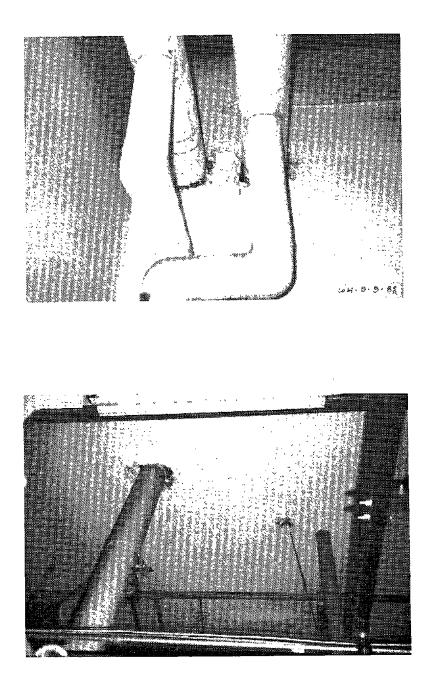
Two of three data processing facilities, affected by the 1987 Whittier Earthquake, where movement of piping damaged wall penetrations. The pipes were undamaged in all cases.
